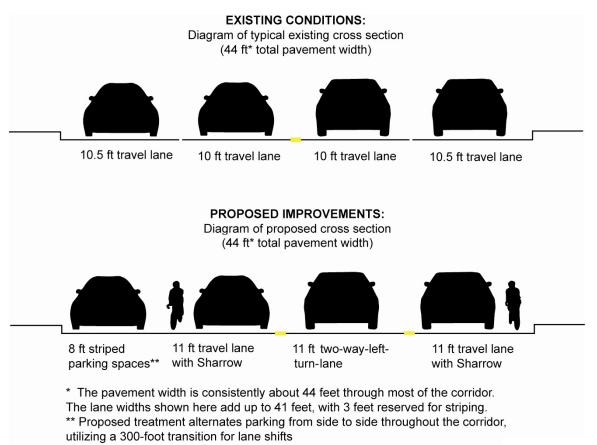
Bethlehem Pike — Existing and Proposed Cross-Sections
